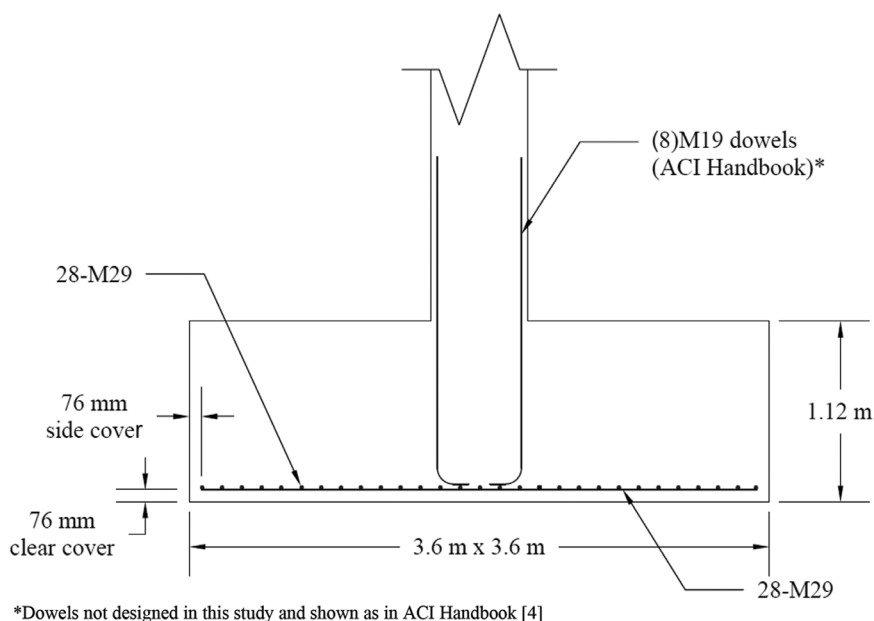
GFRP-RC footing designed as per ACI 440.11 reinforcement detailing.
